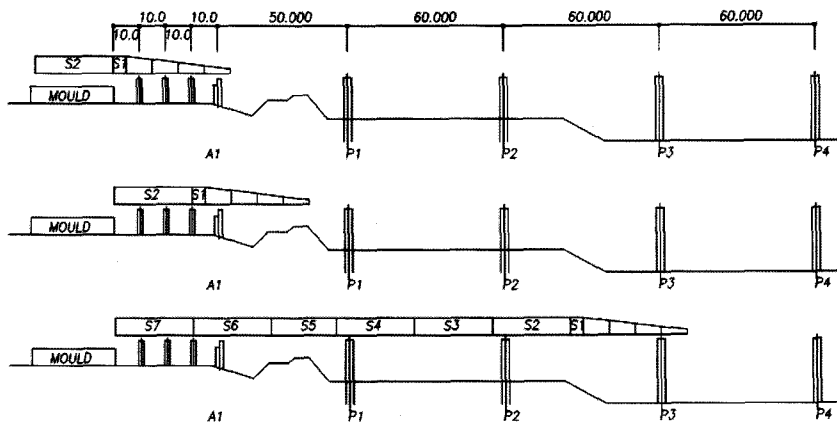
Segmental launching process of Ilsun Bridge(7th construction stage).
